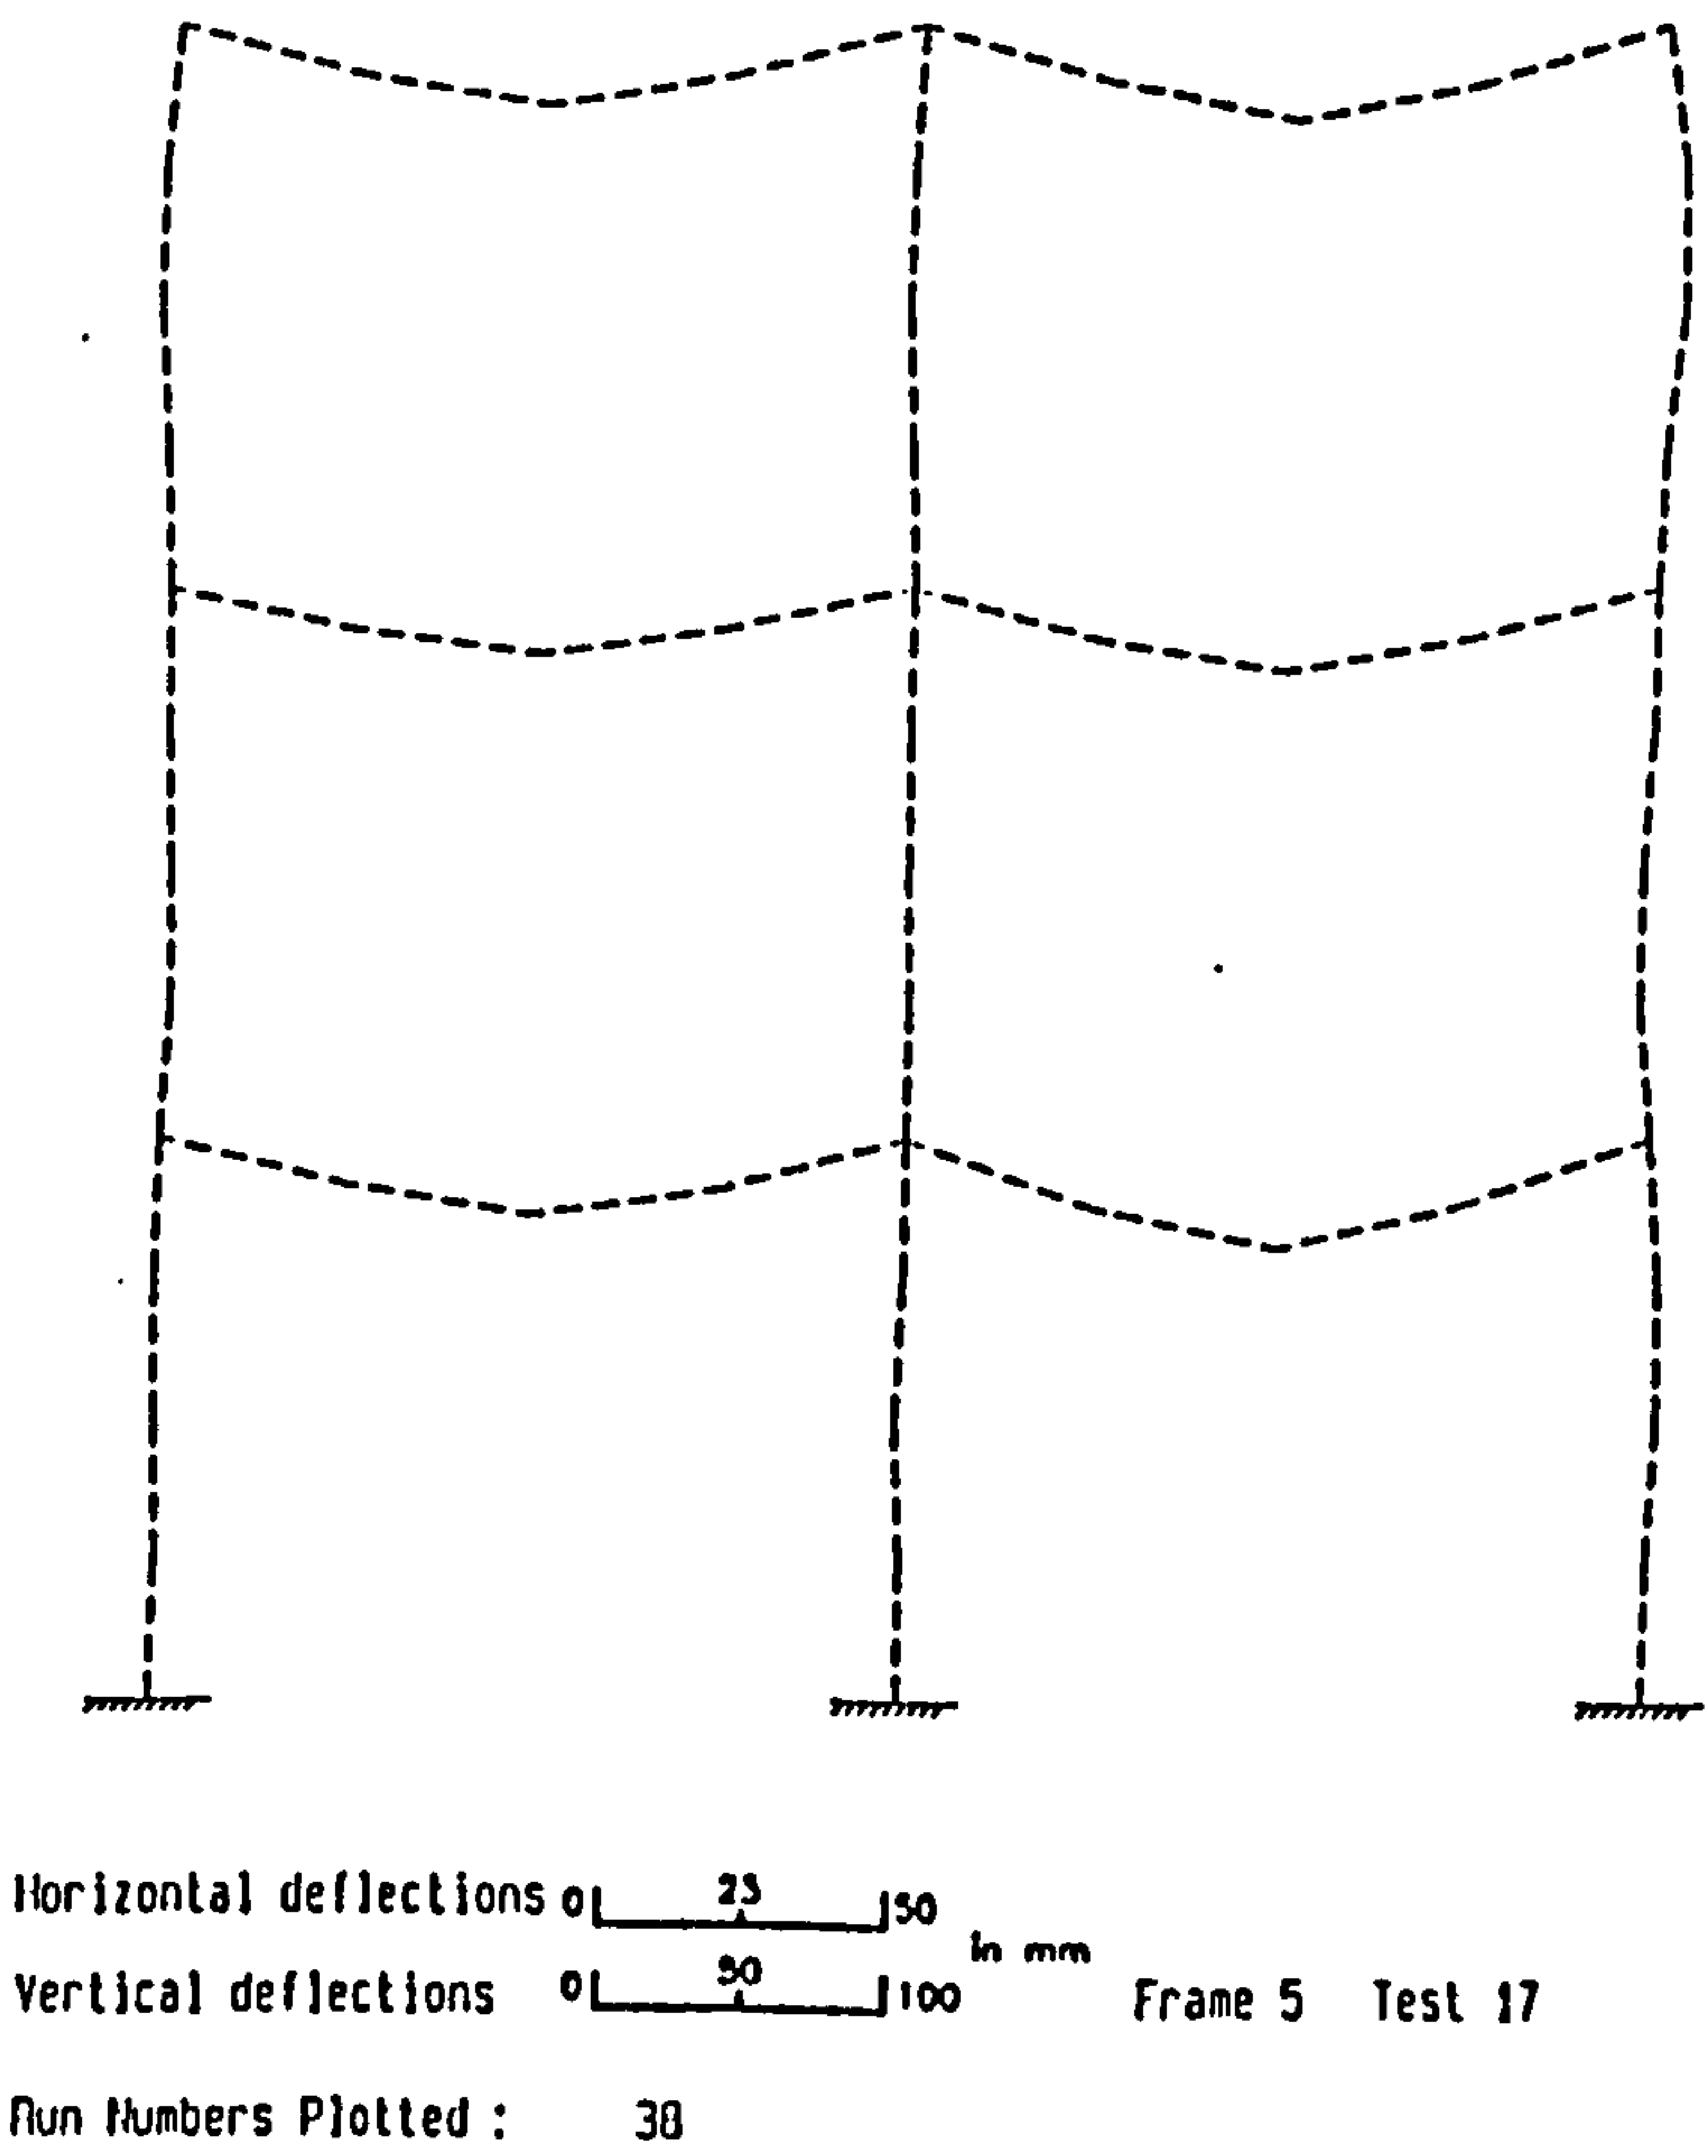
Frame Deformation around the Frame in Test 17 of Frame 5 in Failure of the Central Column
